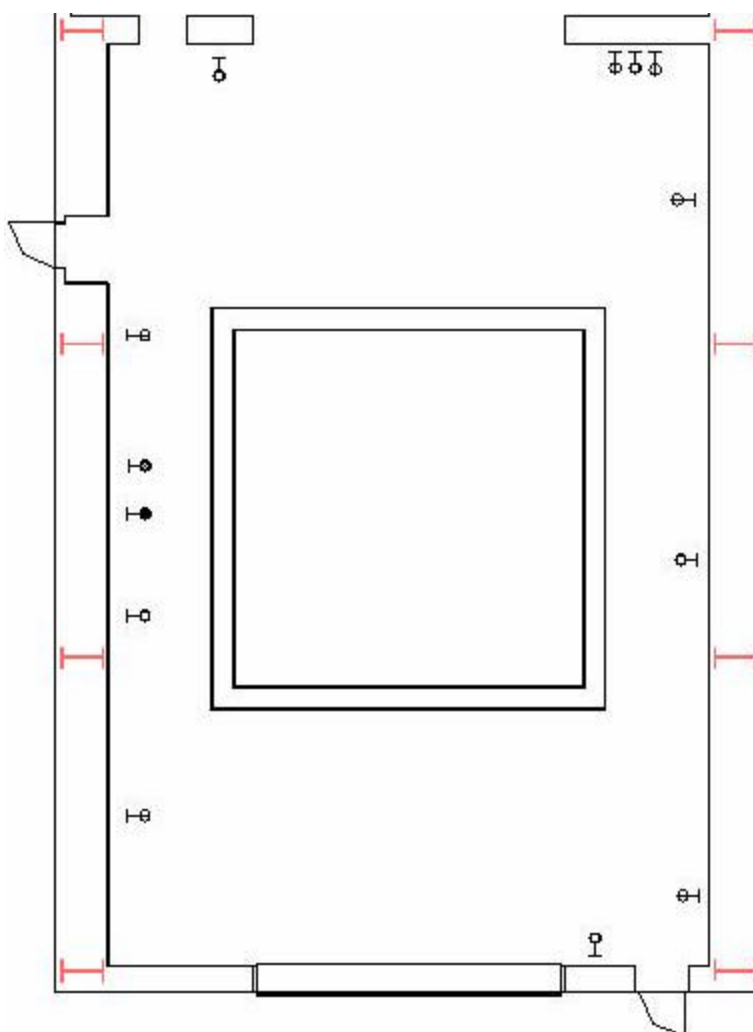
Common (Shared) Air Lock in Building 1032 – Layout
